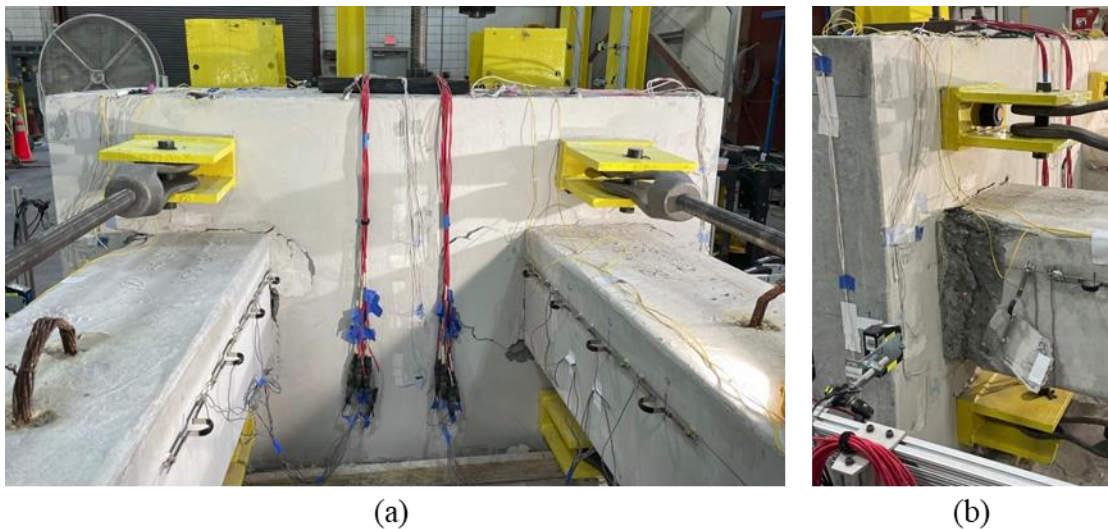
SP-02 failure mechanism (a) pile cap crushing (b) spalling of concrete on west pile
